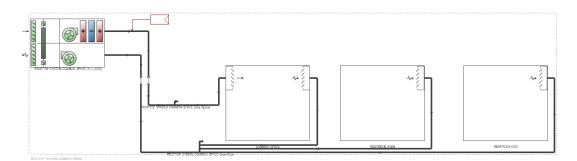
Functional scheme of hallway and restrooms rooftop system
